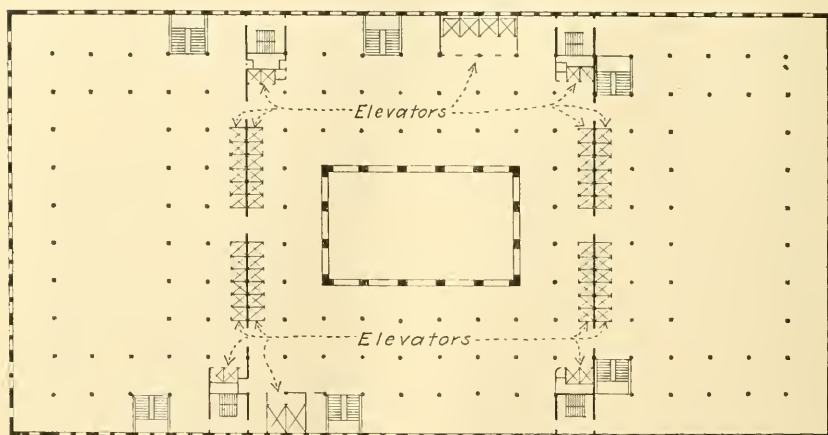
DEPARTMENT STORE FLOOR PLAN SHOWING PRESENT ARRANGEMENT OF FIRE WALLS, ELEVATORS AND STAIRS
